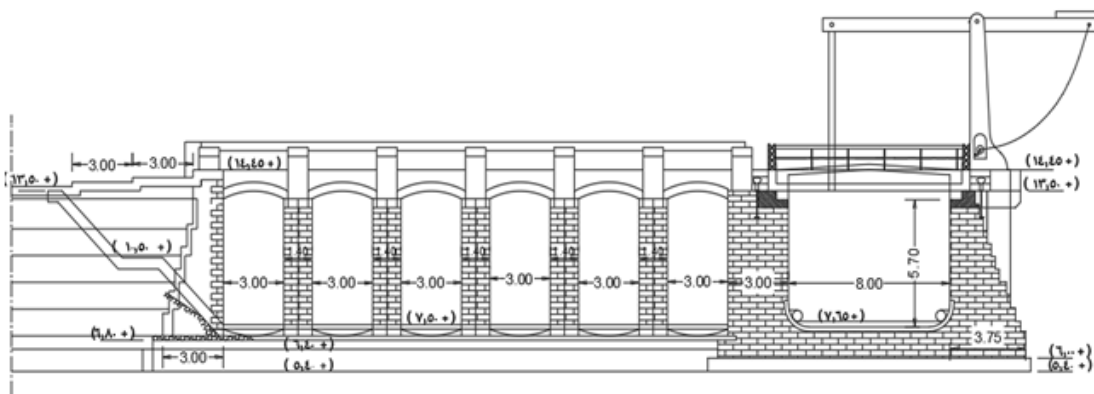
Elevation showing, regular, navigation lock, and the steel bridge [original Design Drawings, 1888]
